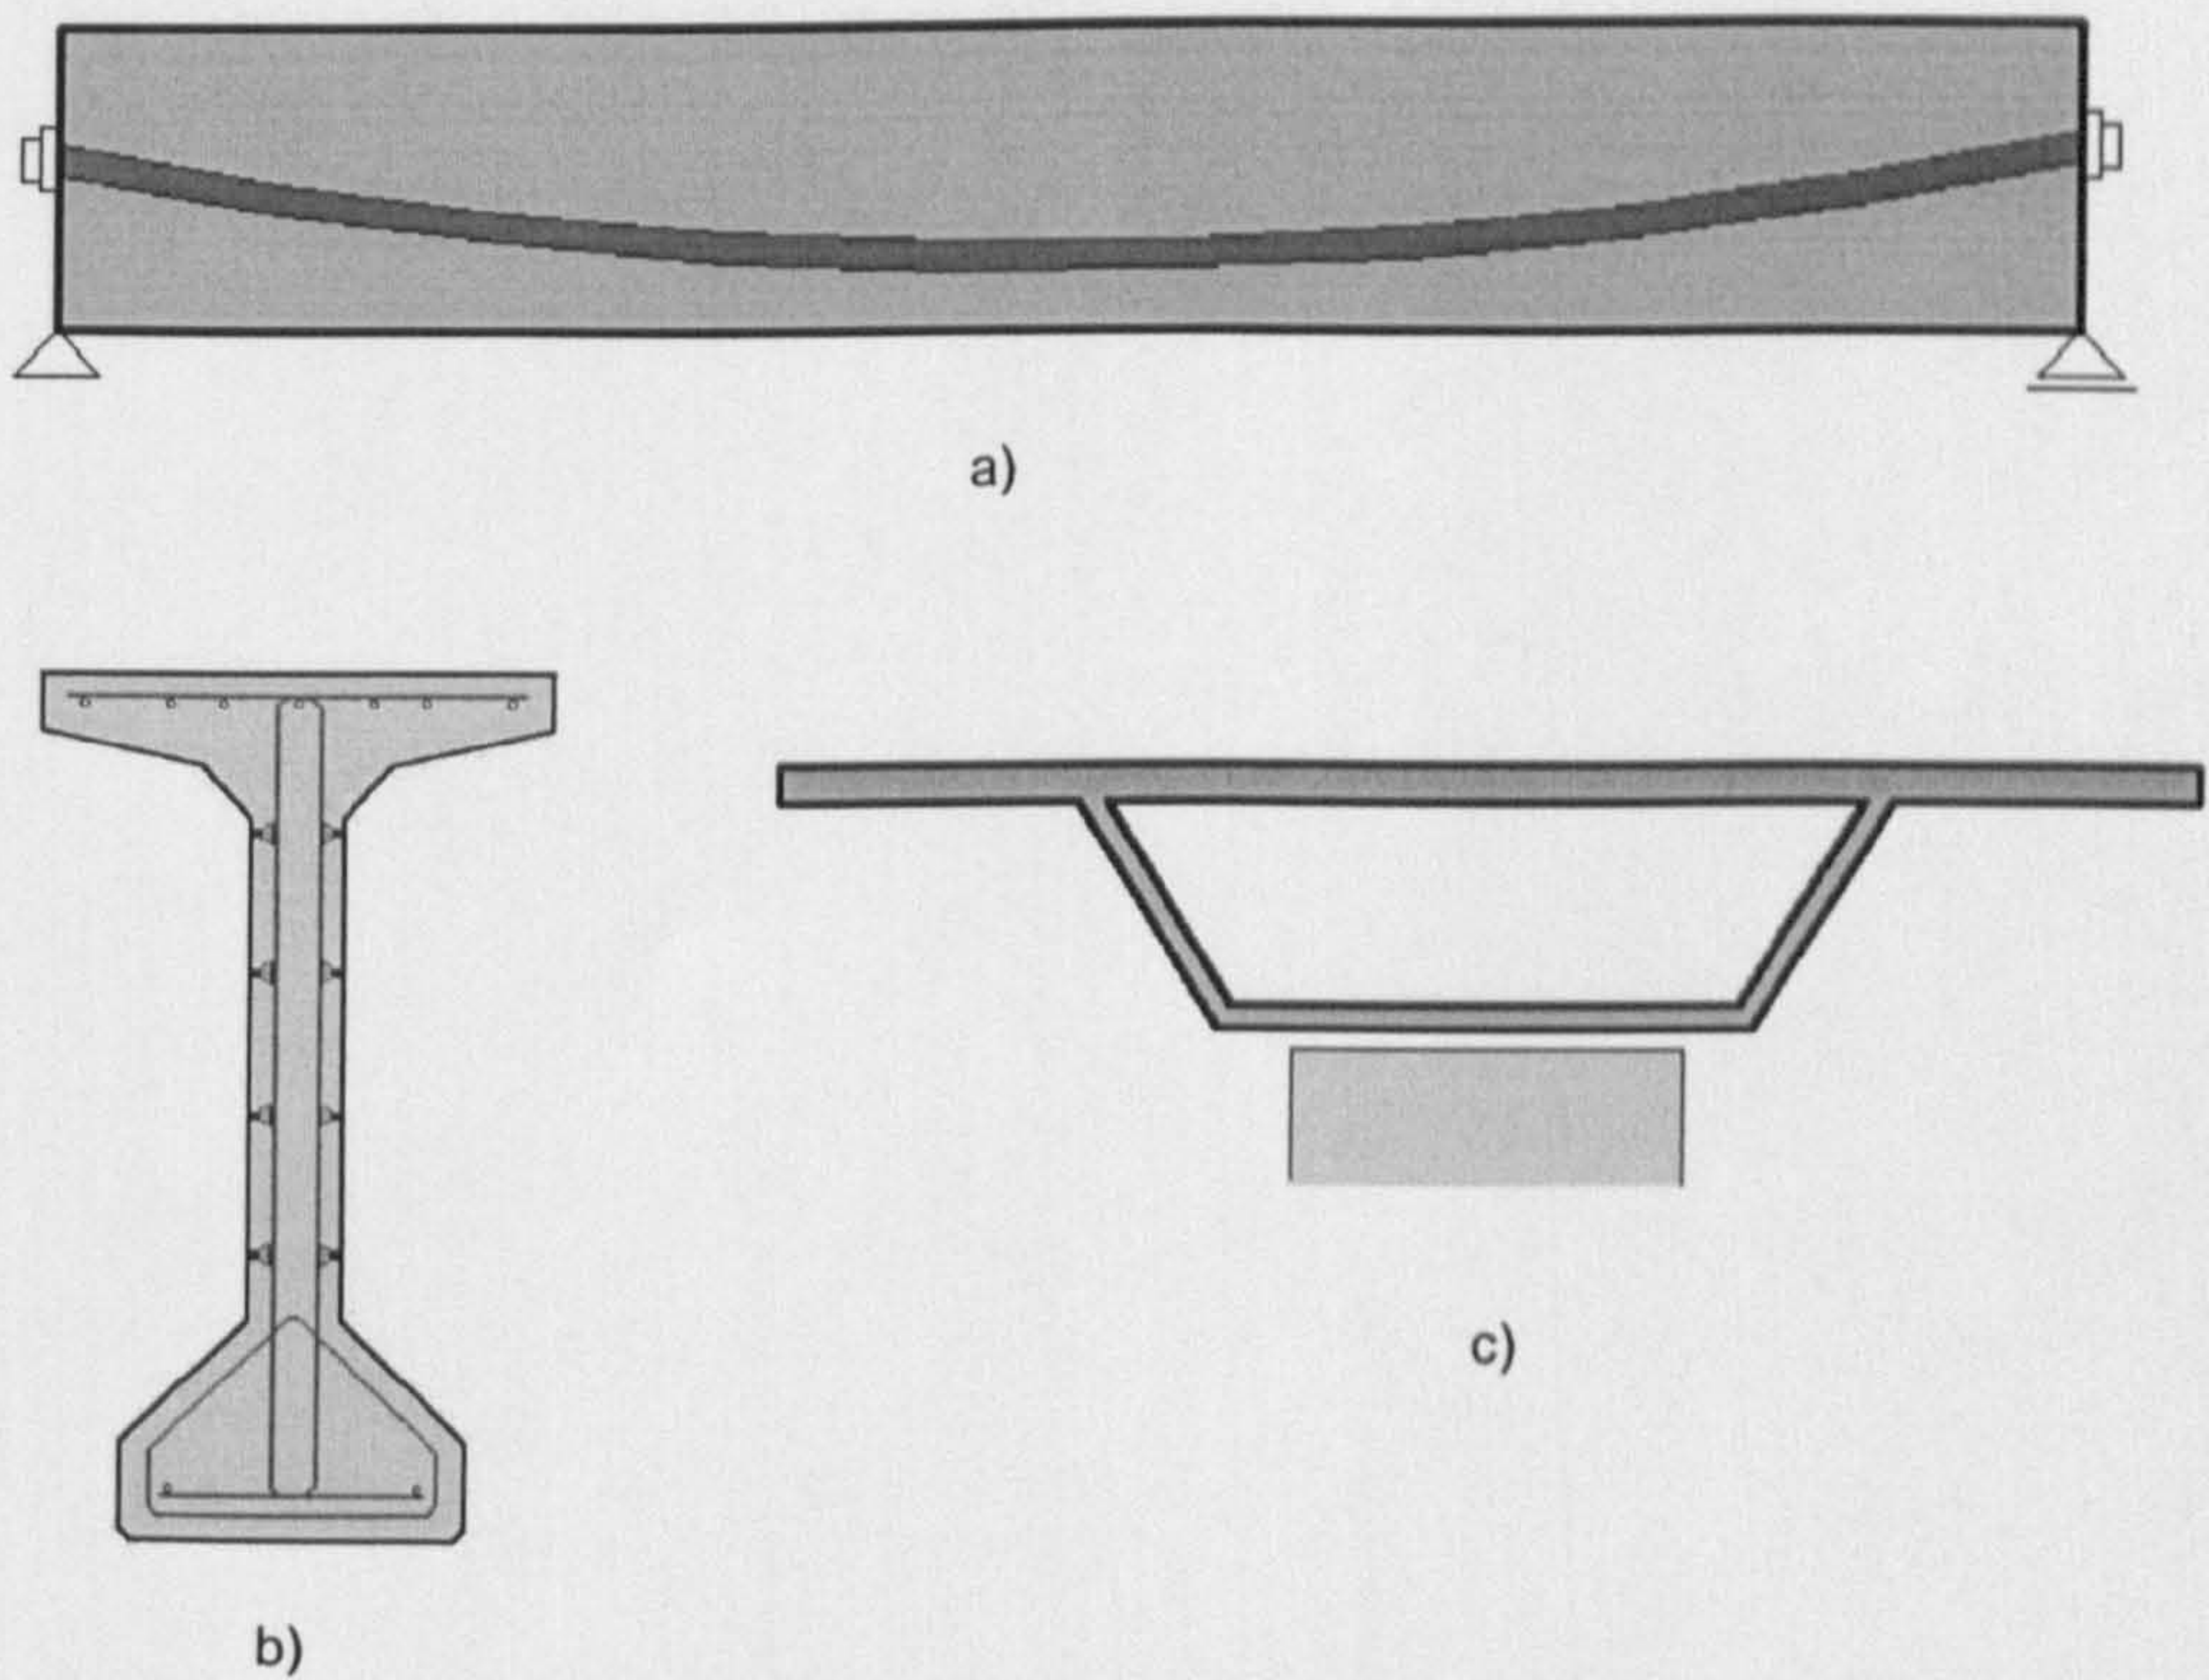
a) Pre-tensioned beam, b) I section, c) deck bridge section
